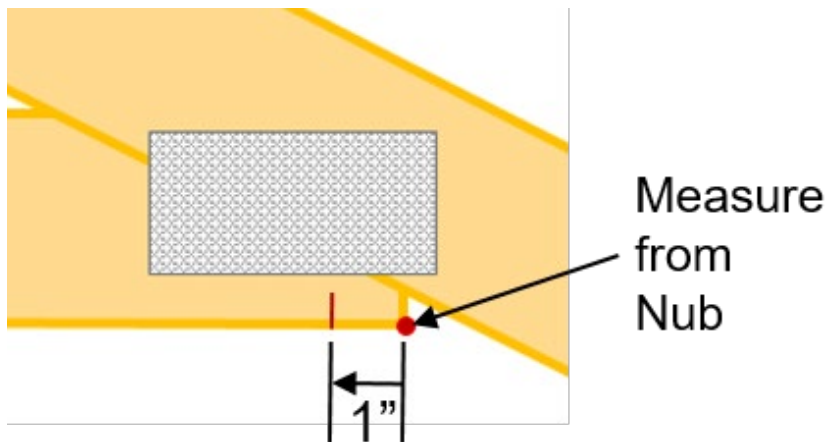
Marking Truss for Overhang for Sloped Soffit
